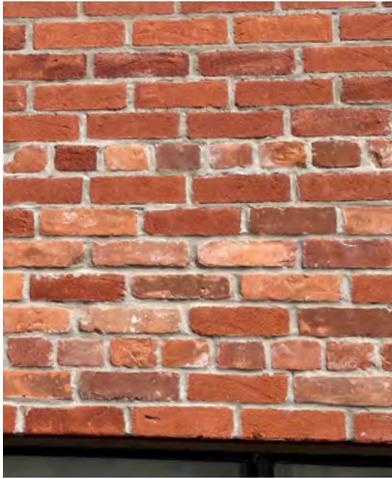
South elevation repointing and mild spalling above window (ERA, 2022).
